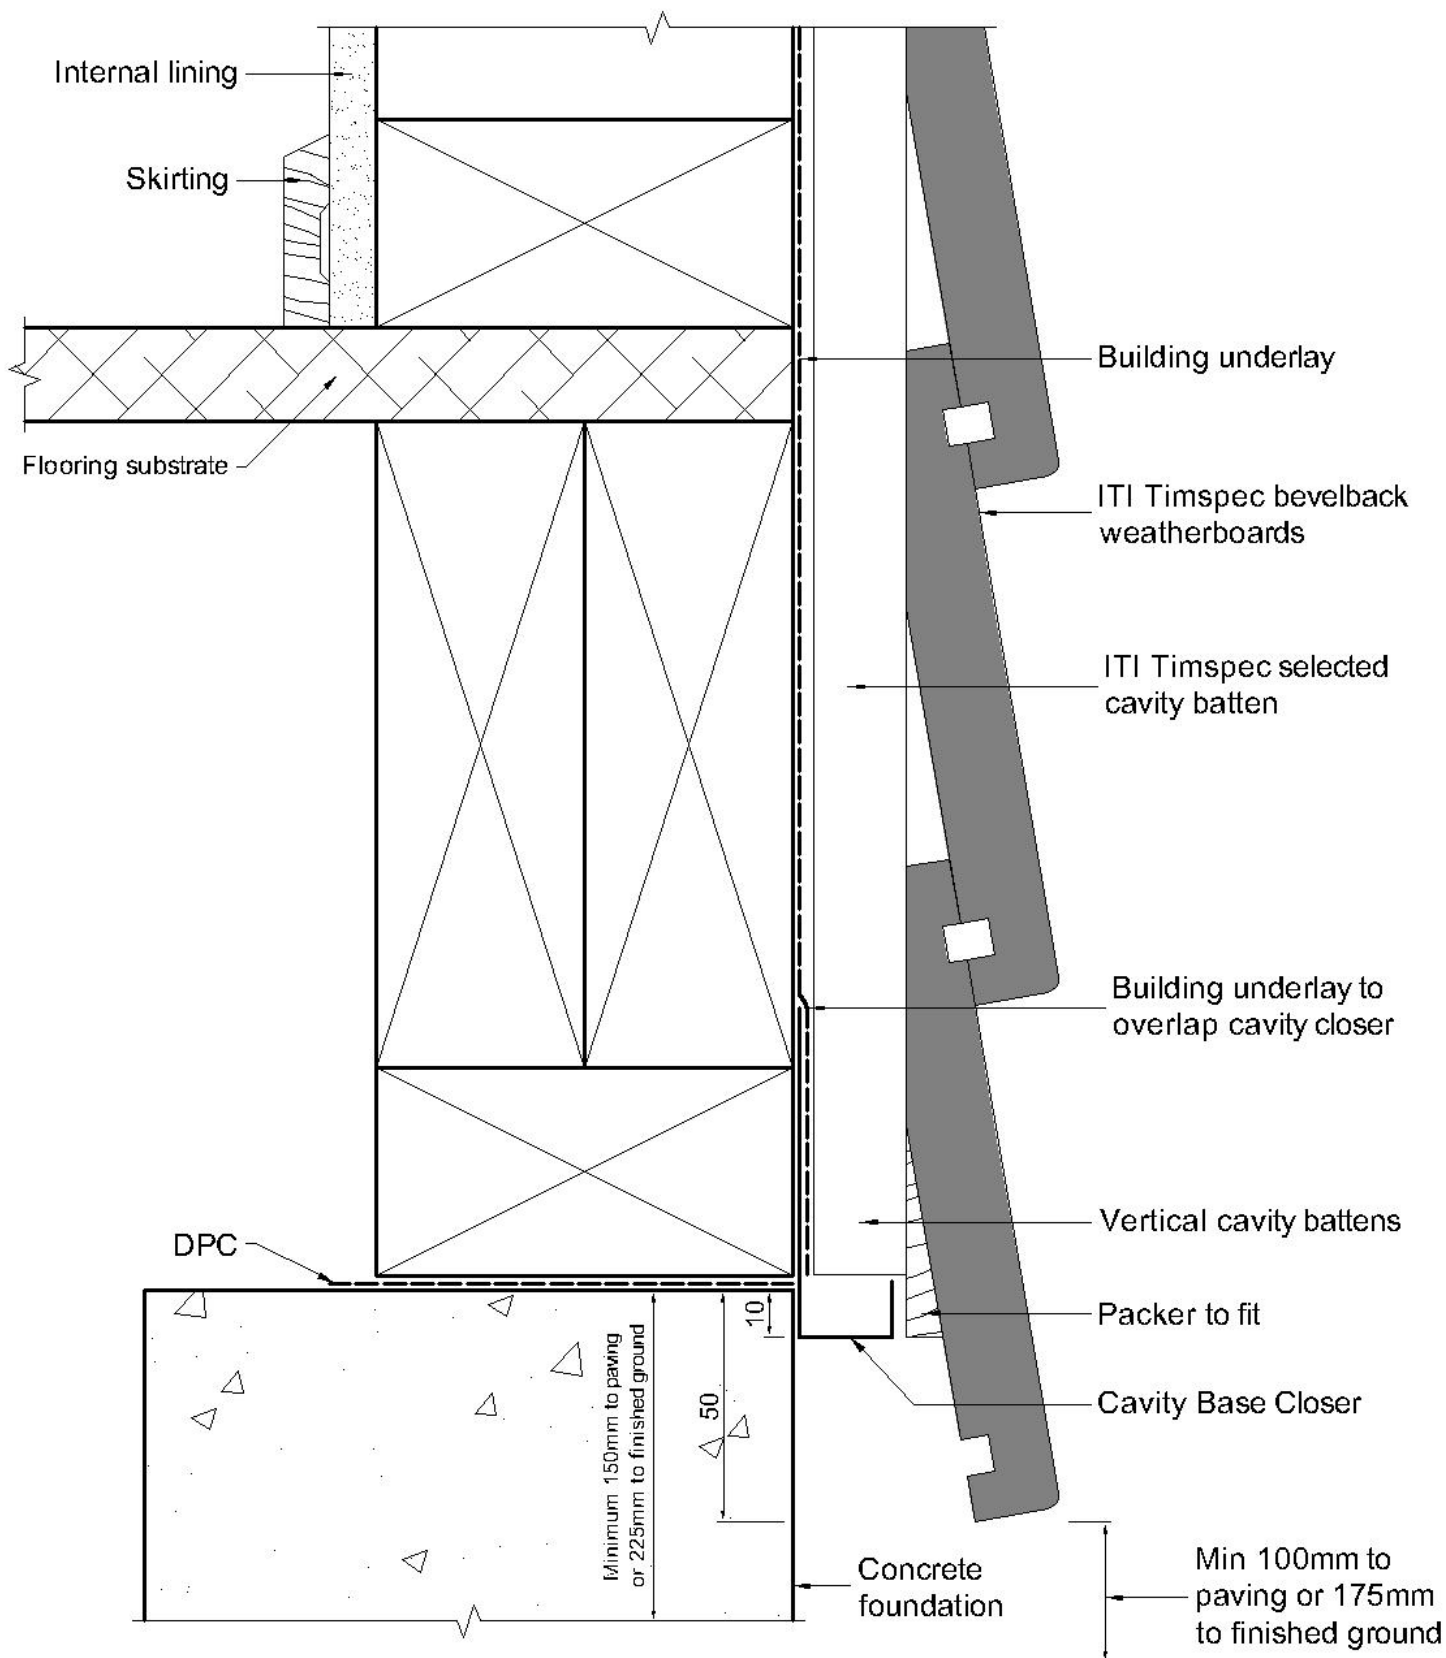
13 BC 502 BASE, CONCRETE SLAB ON GROUND
